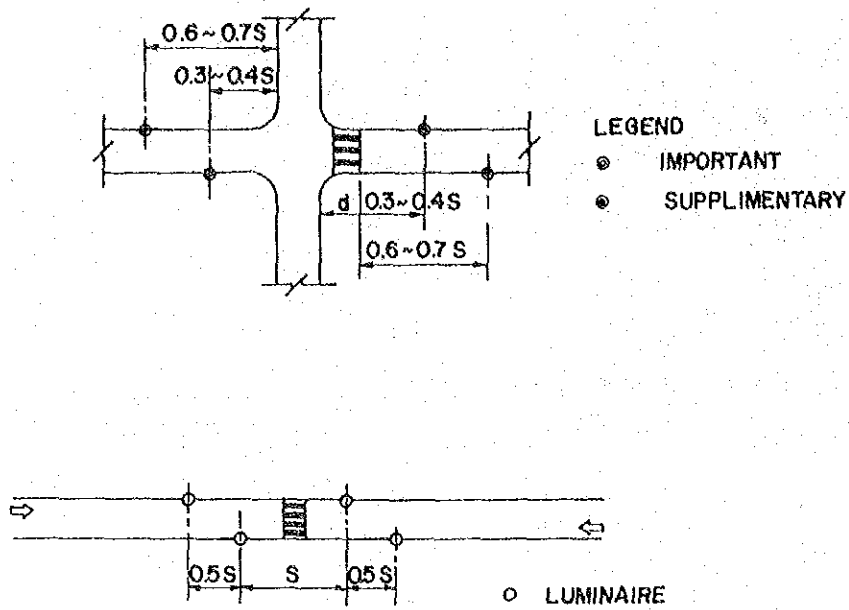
Typical Luminaire Arrangement (Crosswalk)
